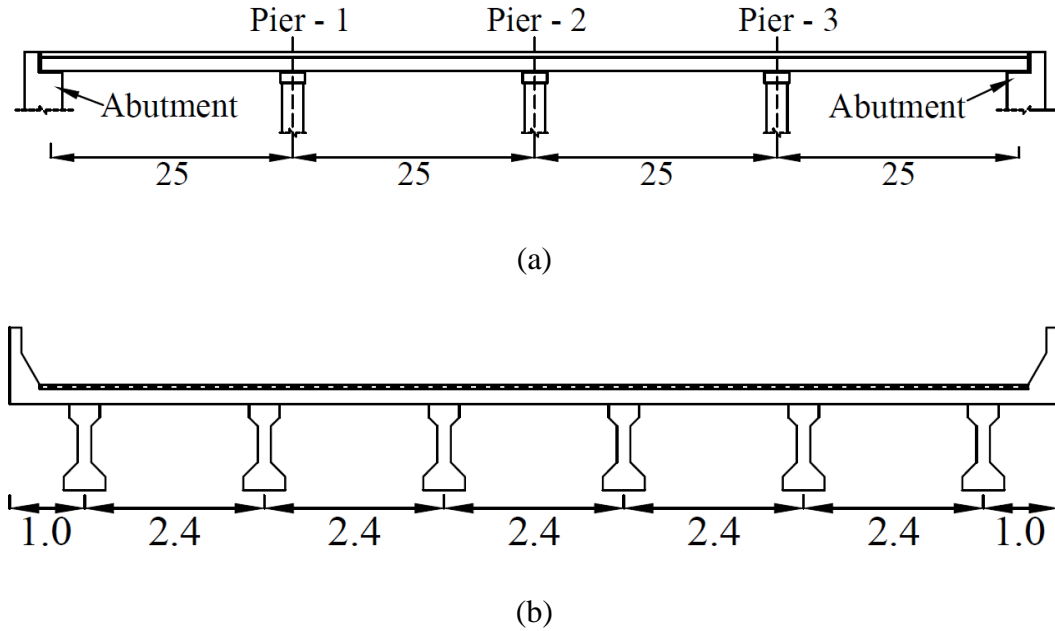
Details of the benchmark bridge (a) Elevation view, (b) Deck cross-section (all dimensions are in meters)
